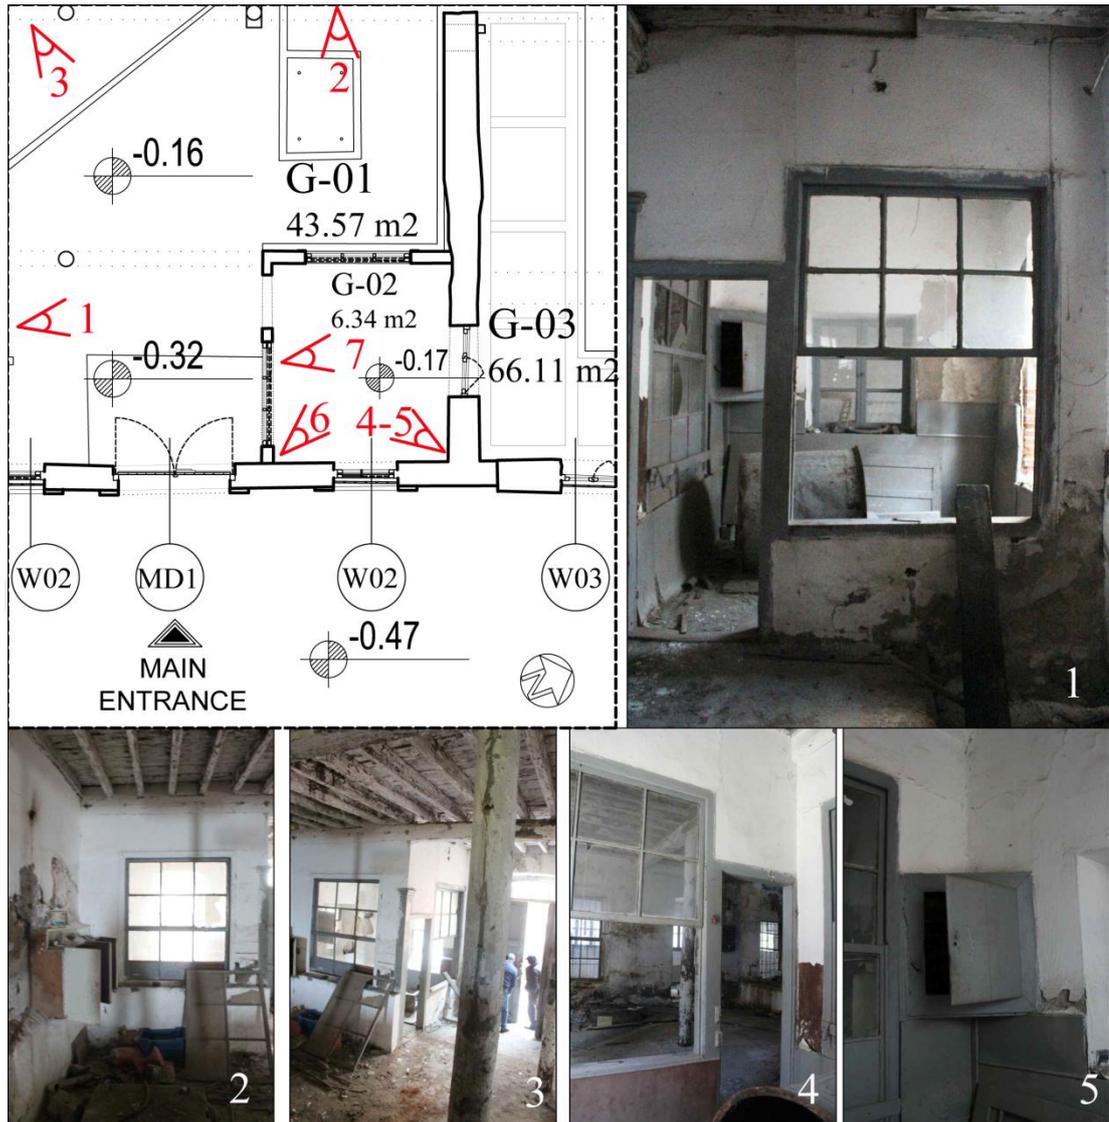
Space G-02 photograph key plan; 1-2-3:general view of the Space; 4: Tin sheet on the wall;5: timber cupboard detail.
